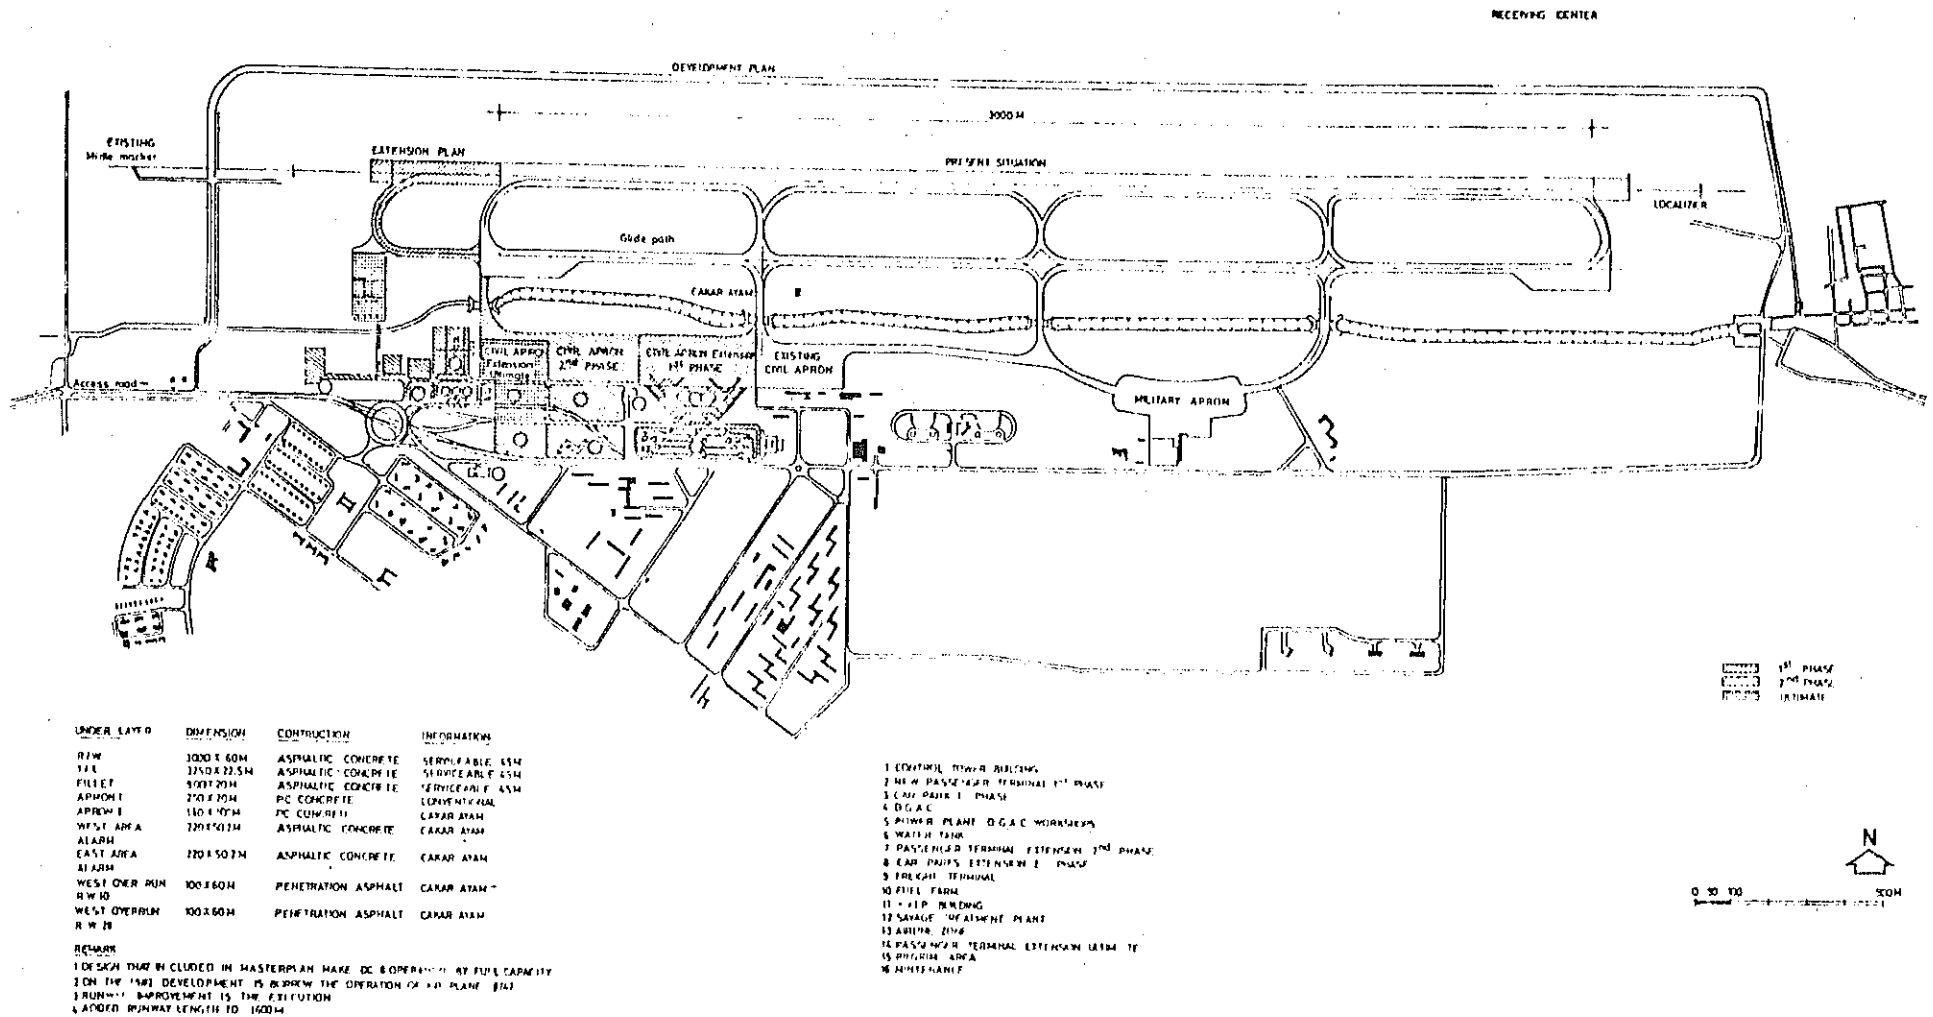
DEVELOPMENT PLAN OF JUANDA AIRPORT
